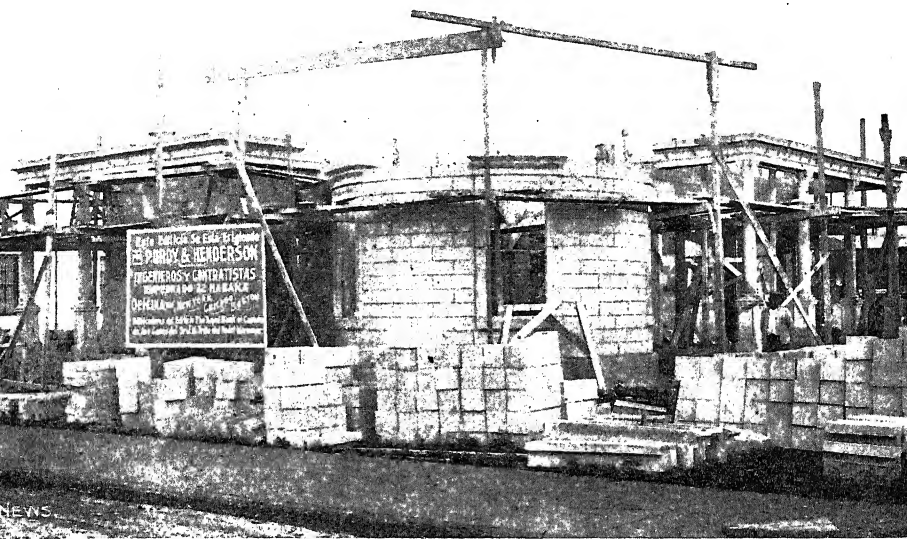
PLATE XVI. Havana Residence Under Construction of Concrete Blocks.
